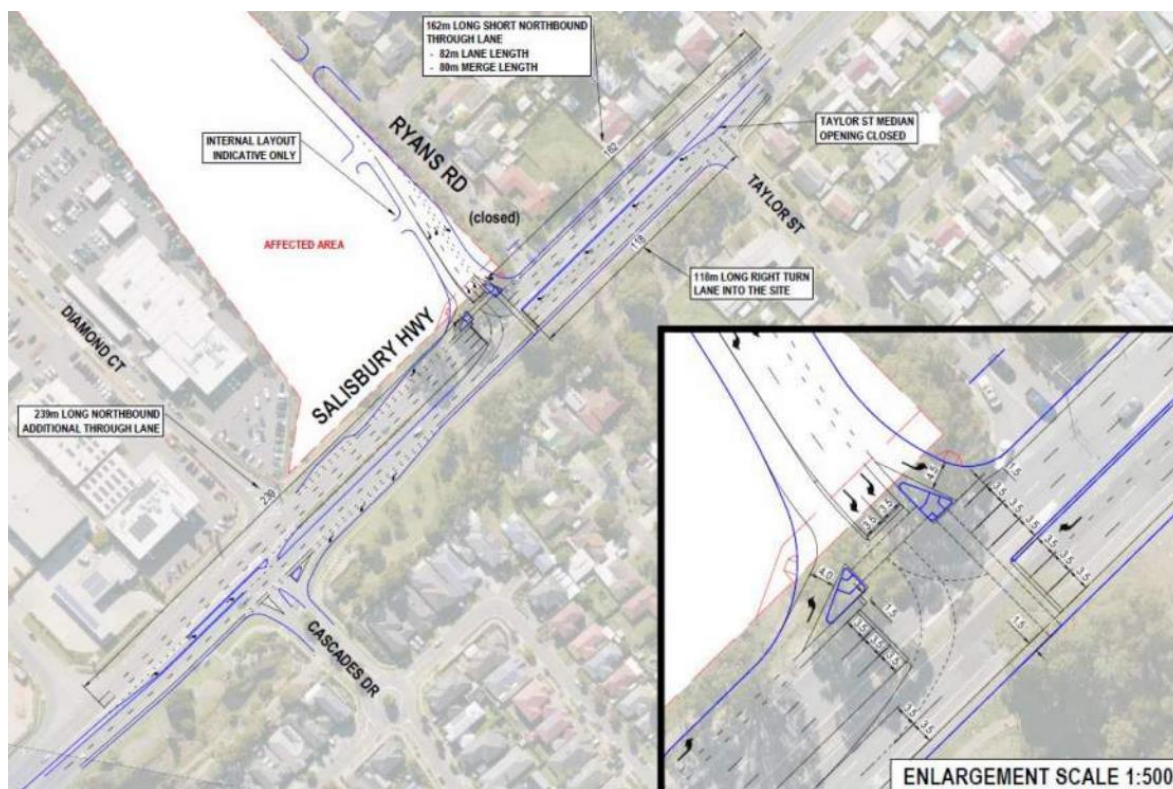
Concept plan of new traffic Lights immediately south of Ryans Road and Ryans Road being a cul-de-sac. This also involves left in left out only at Taylor Road.
